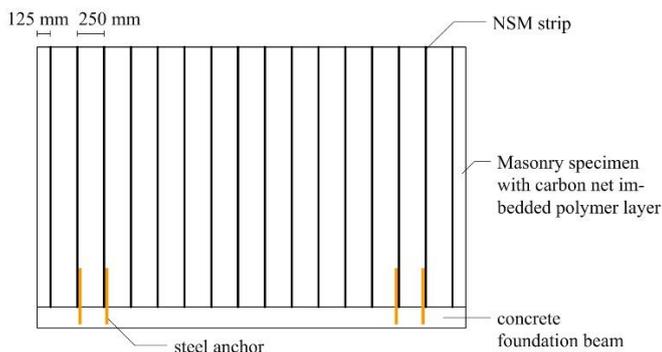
Schematic view of the reinforced and anchored wall specimen with no opening
